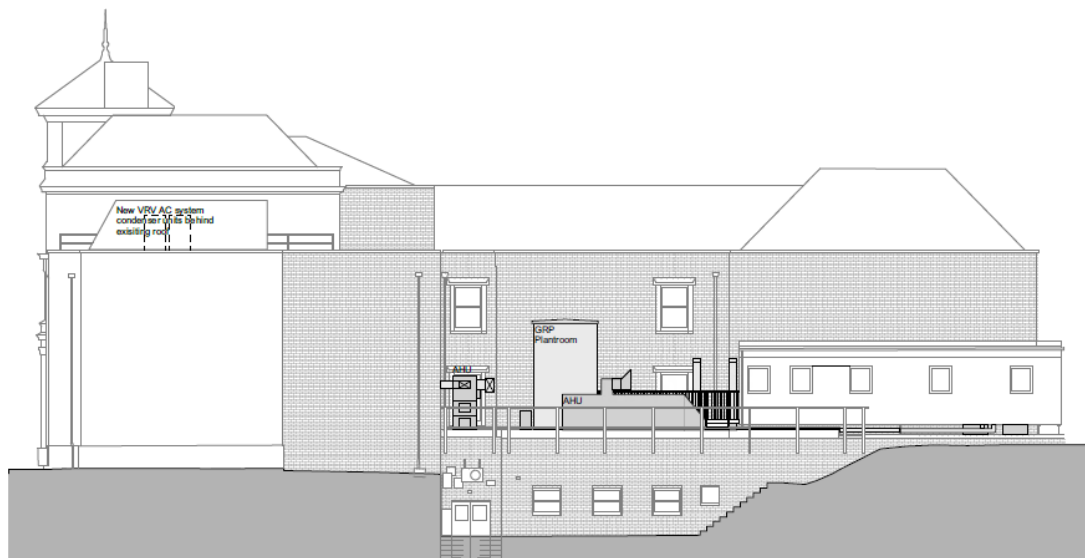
previously approved rooftop equipment (DC/21/123944)
